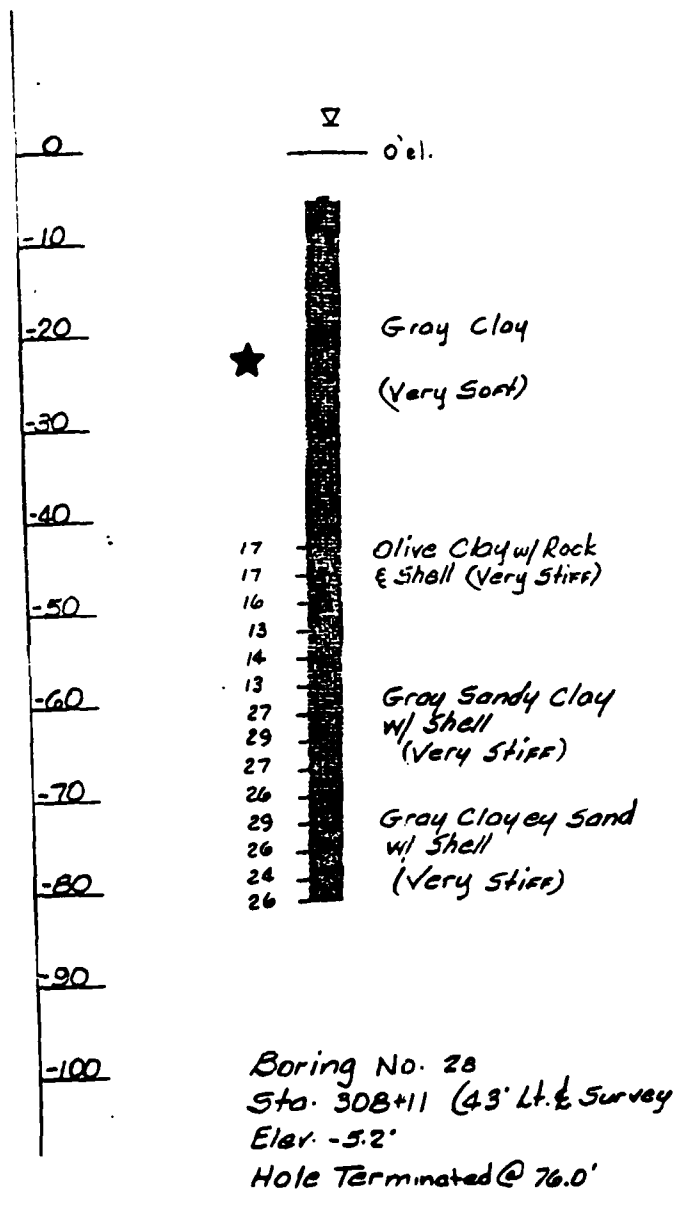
Boring Log Summary, Apalachicola Bay Bridge FSB 22 (Site 3)
